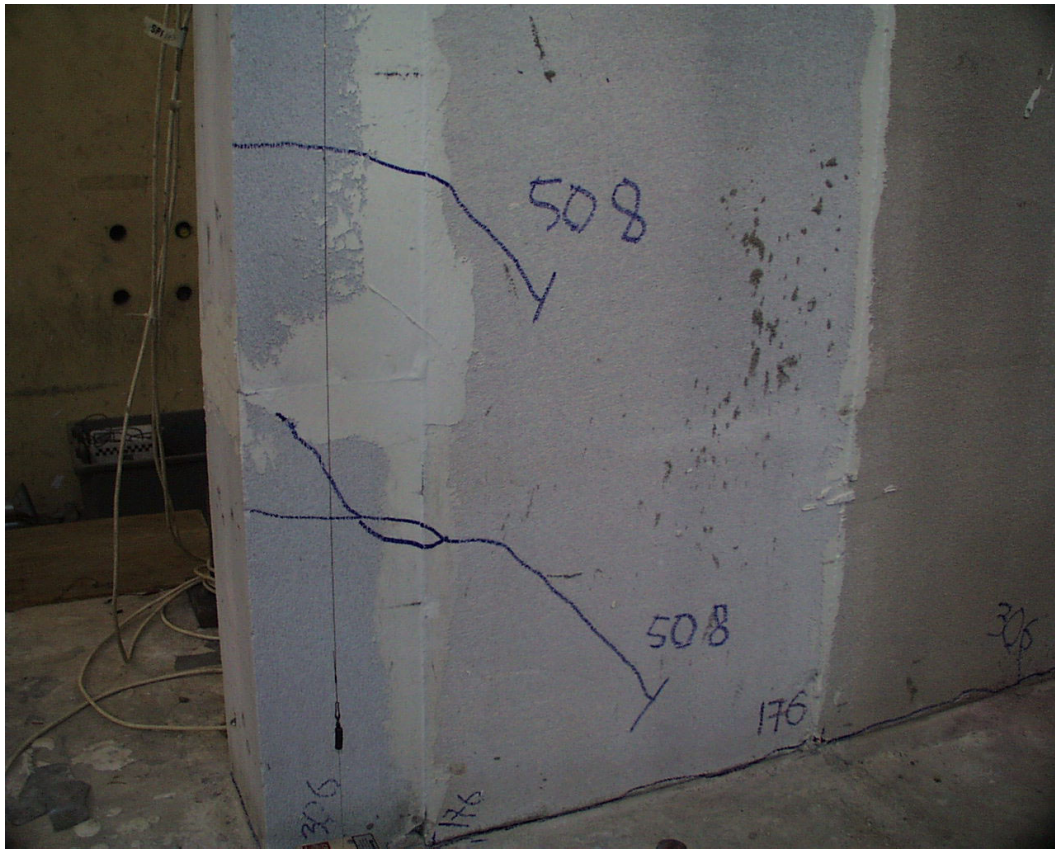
Formation of flexural cracking in Shear Wall Specimen 17
